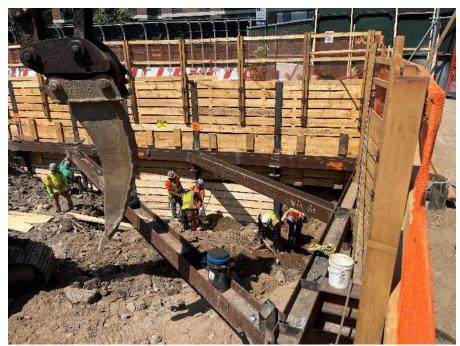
CCJV installing timber lagging for SOE installation along the northern site boundary (facing north).
